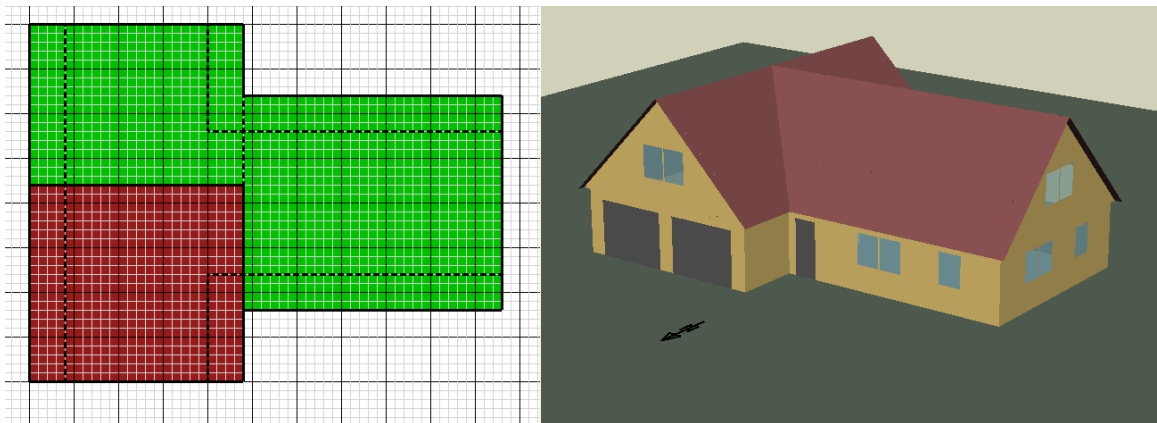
First floor of the design. The green area represents living space, while the maroon area represents garage space.
